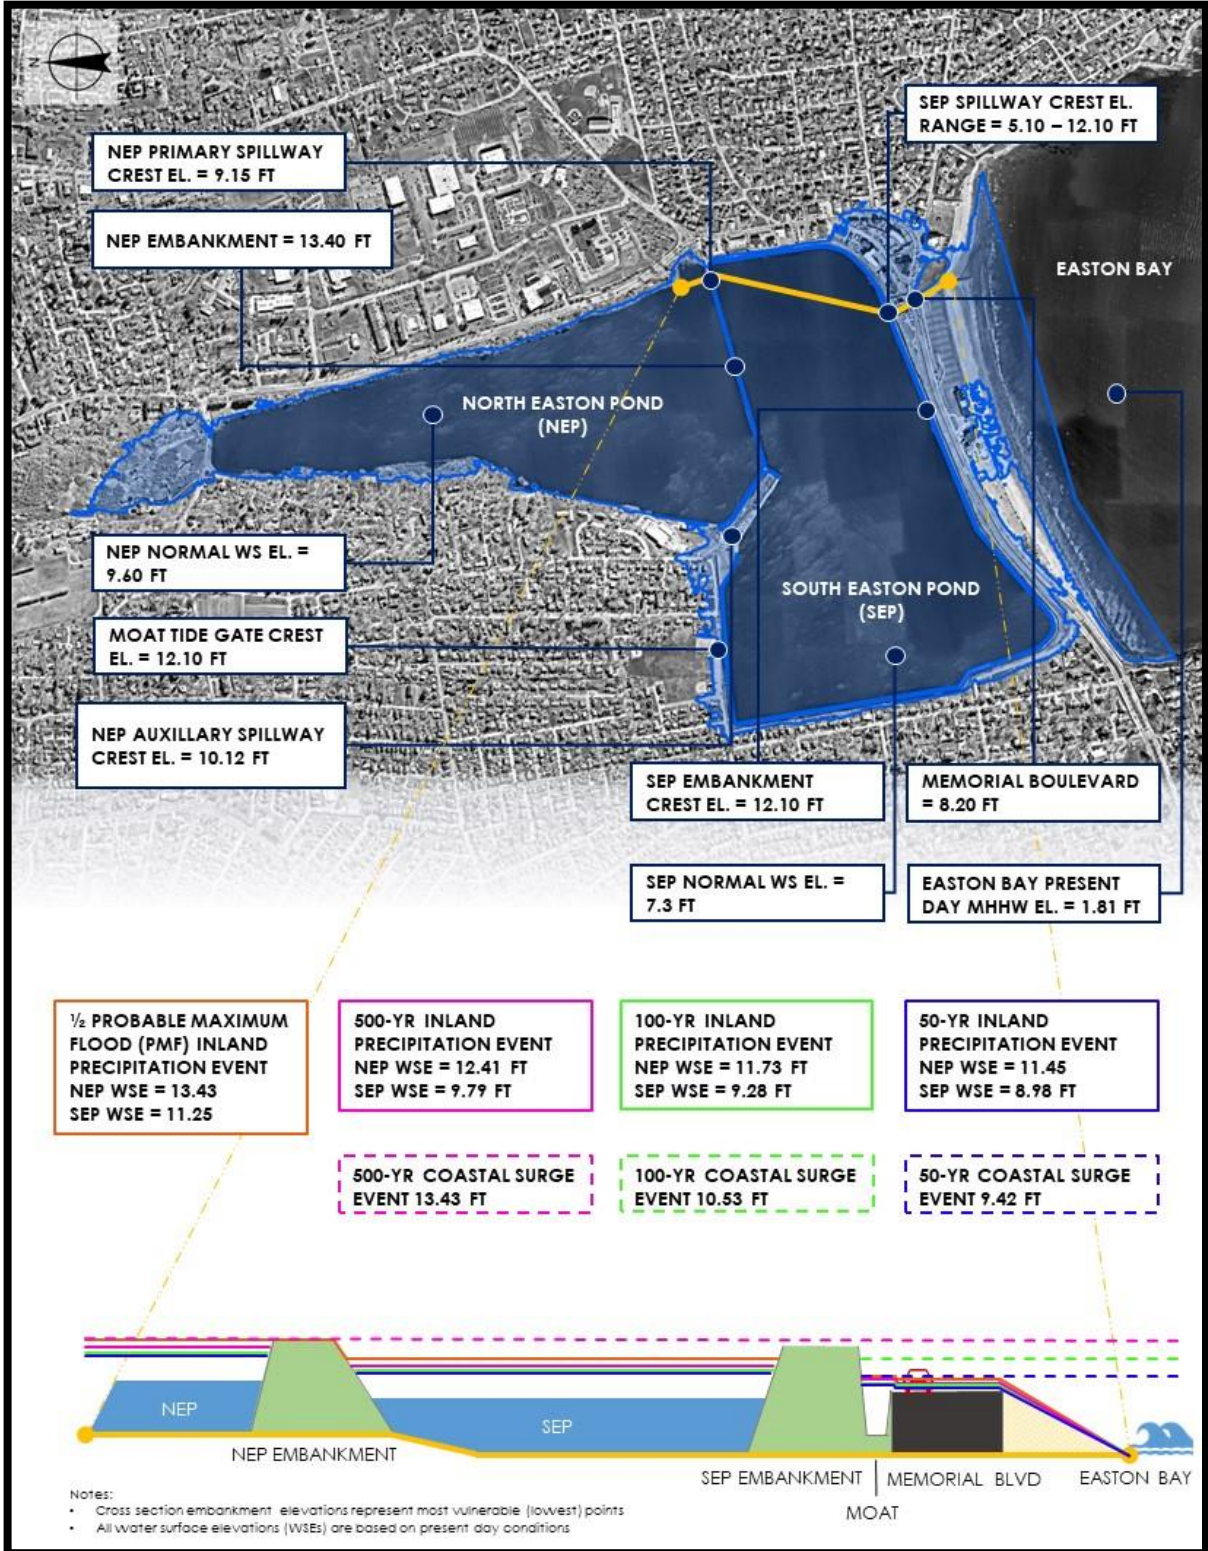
Peak Water Surface Elevations Plan & Profile View for Recommended Alternative (Present-Day)
